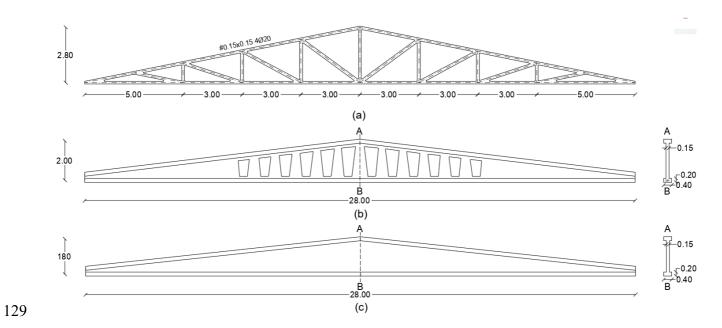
Detailing of the design of the concrete structures (the measurements are shown in metres)
